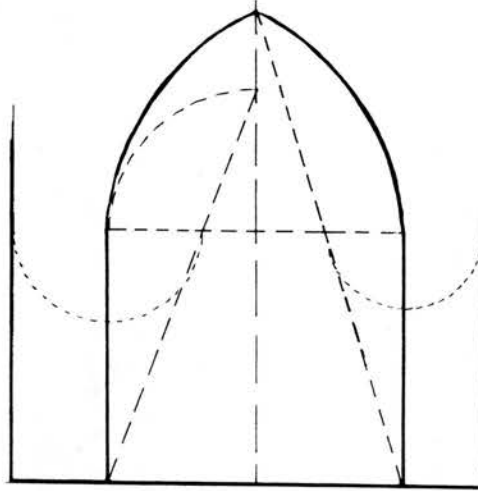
Rodrigo Gil's method (Appendix I Section 4.3.6) adapted to pointed vaults
